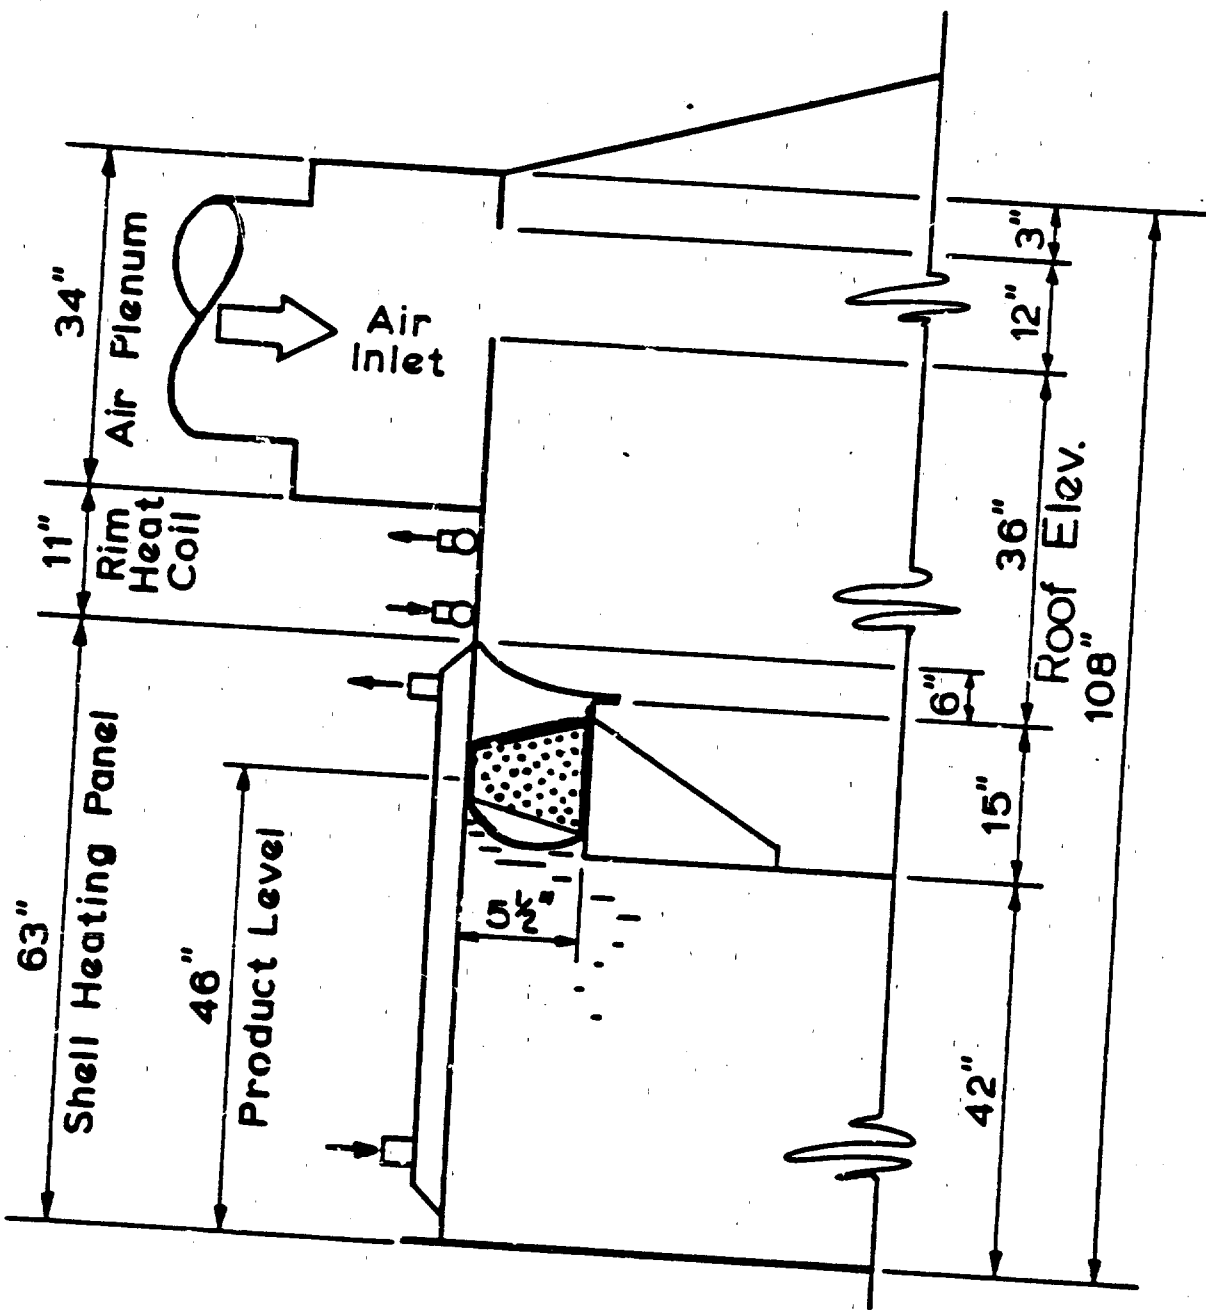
Elevation view of contact welded IFR in test tank.¹
